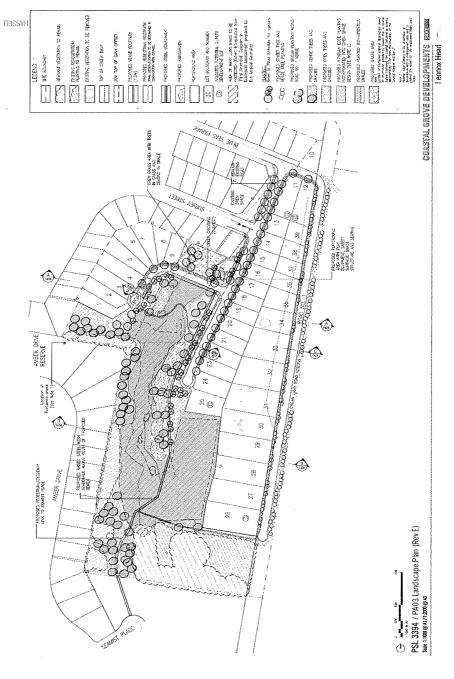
Approved Subdivision Layout (provisions 6.2.3 and 6.2.6)
